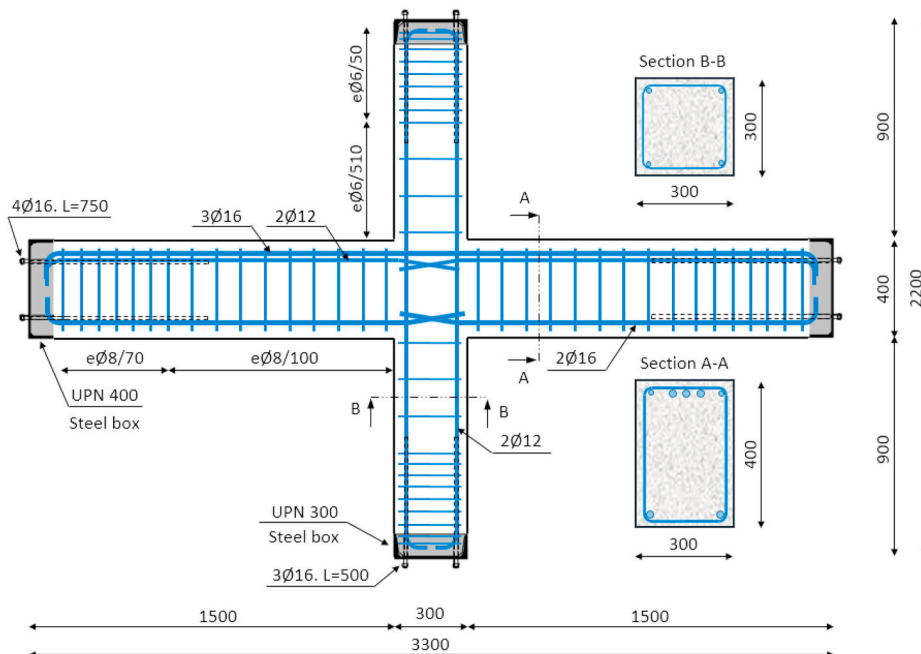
Specimen geometry and reinforcement (dimensions in mm).
